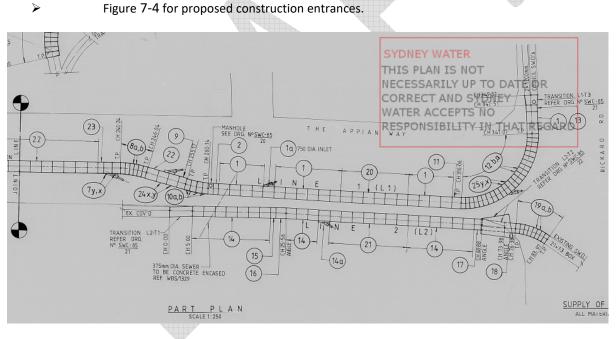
As built box culvert- extract from drawing SWC-85/18
